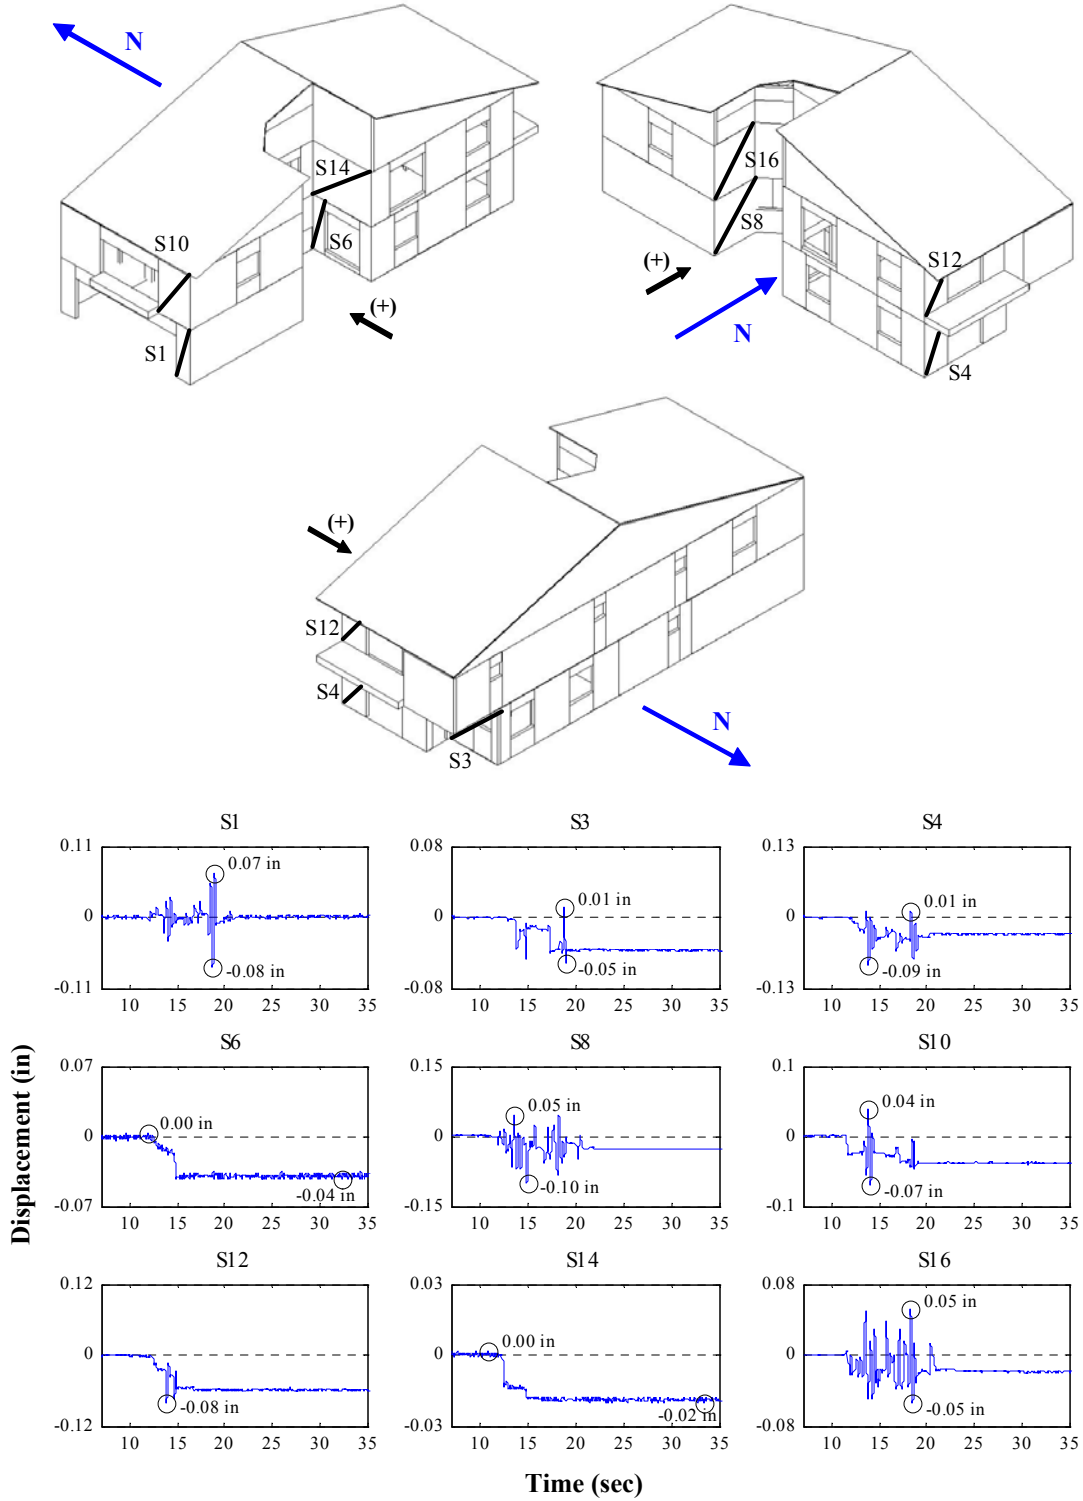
Wall deformations of north-south external walls for Test NWP2S05
